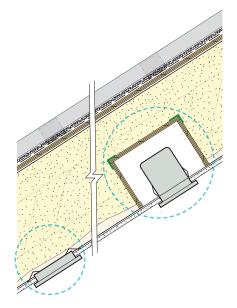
Low-profile puck lights or airtight boxes should be used to avoid direct contact with spray foam
